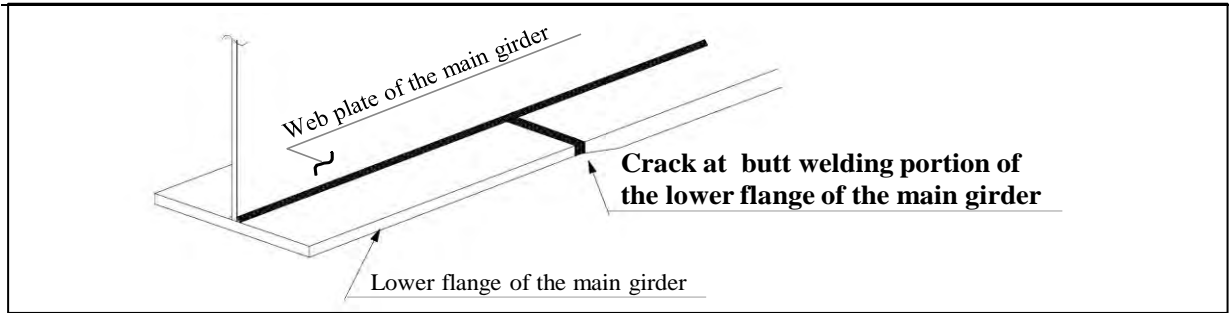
Crack at Butt Welding Portion of the Lower Flanges
